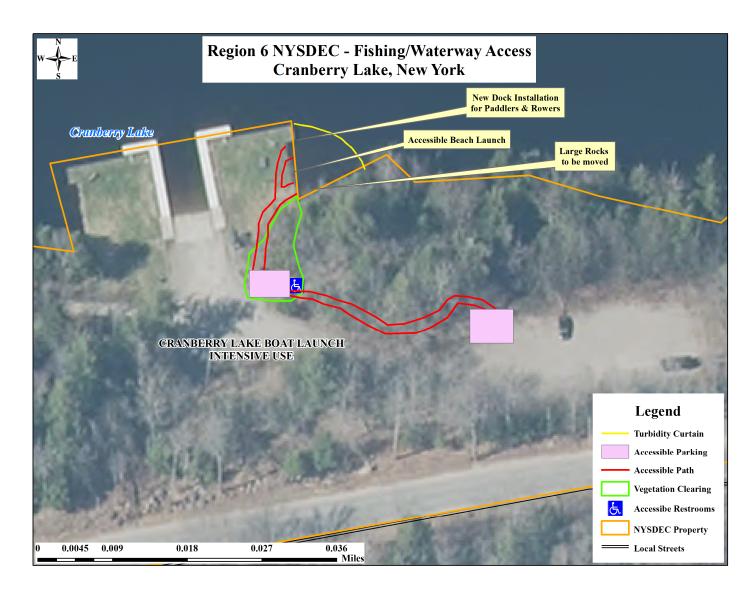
Orthoimagery map of the existing Cranberry Lake BLS with site plan details.
